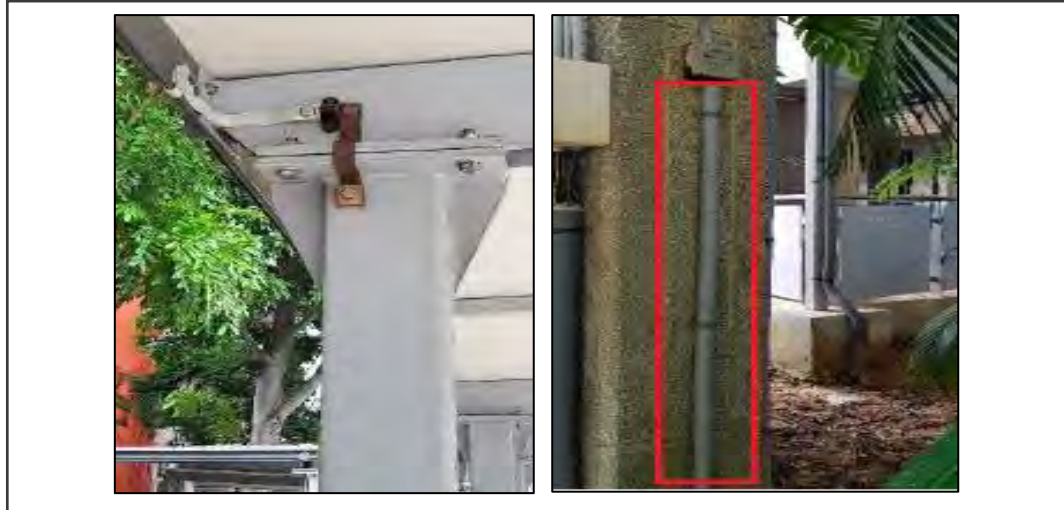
Connector Mounted at High Level and Protected by PVC Pipe
